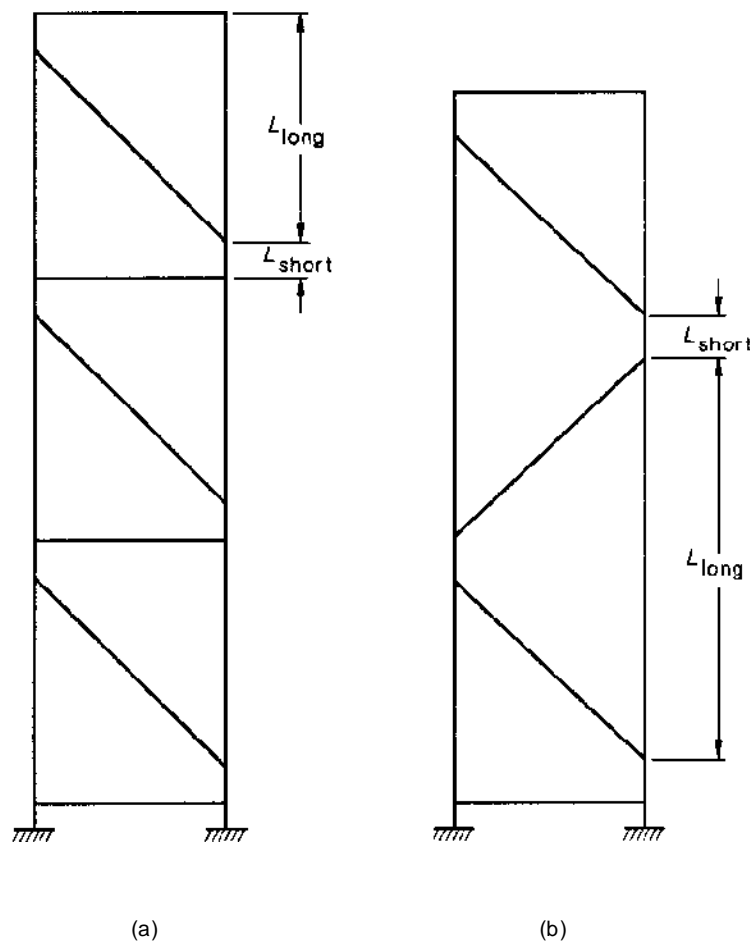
BRACING TYPES WITH DIAGONAL BRACES WHICH INTERSECT COLUMNS
